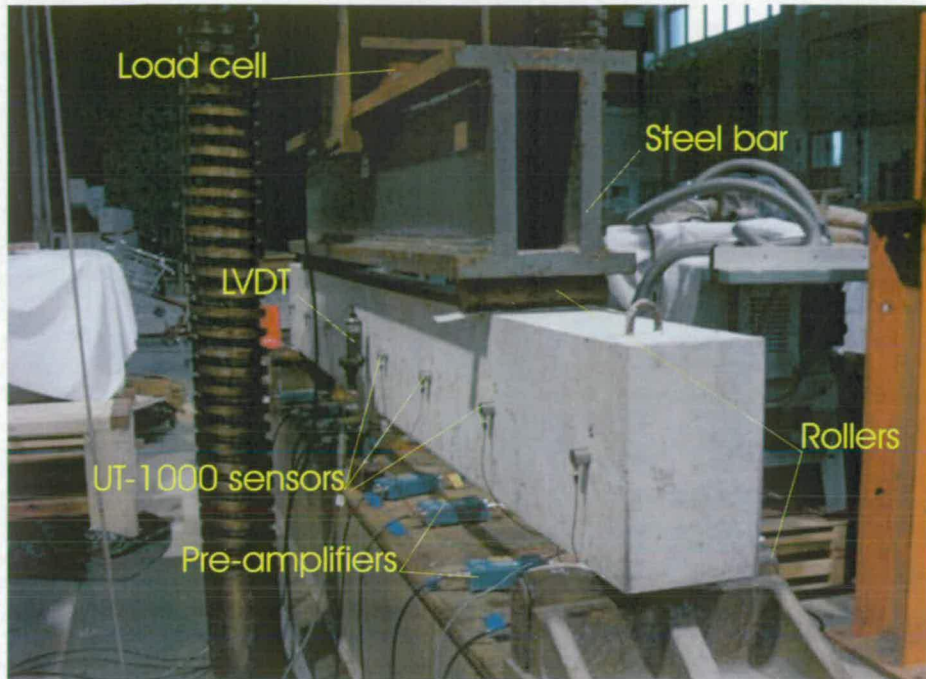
Photo of instrumented beam at Kumamoto Laboratory.
